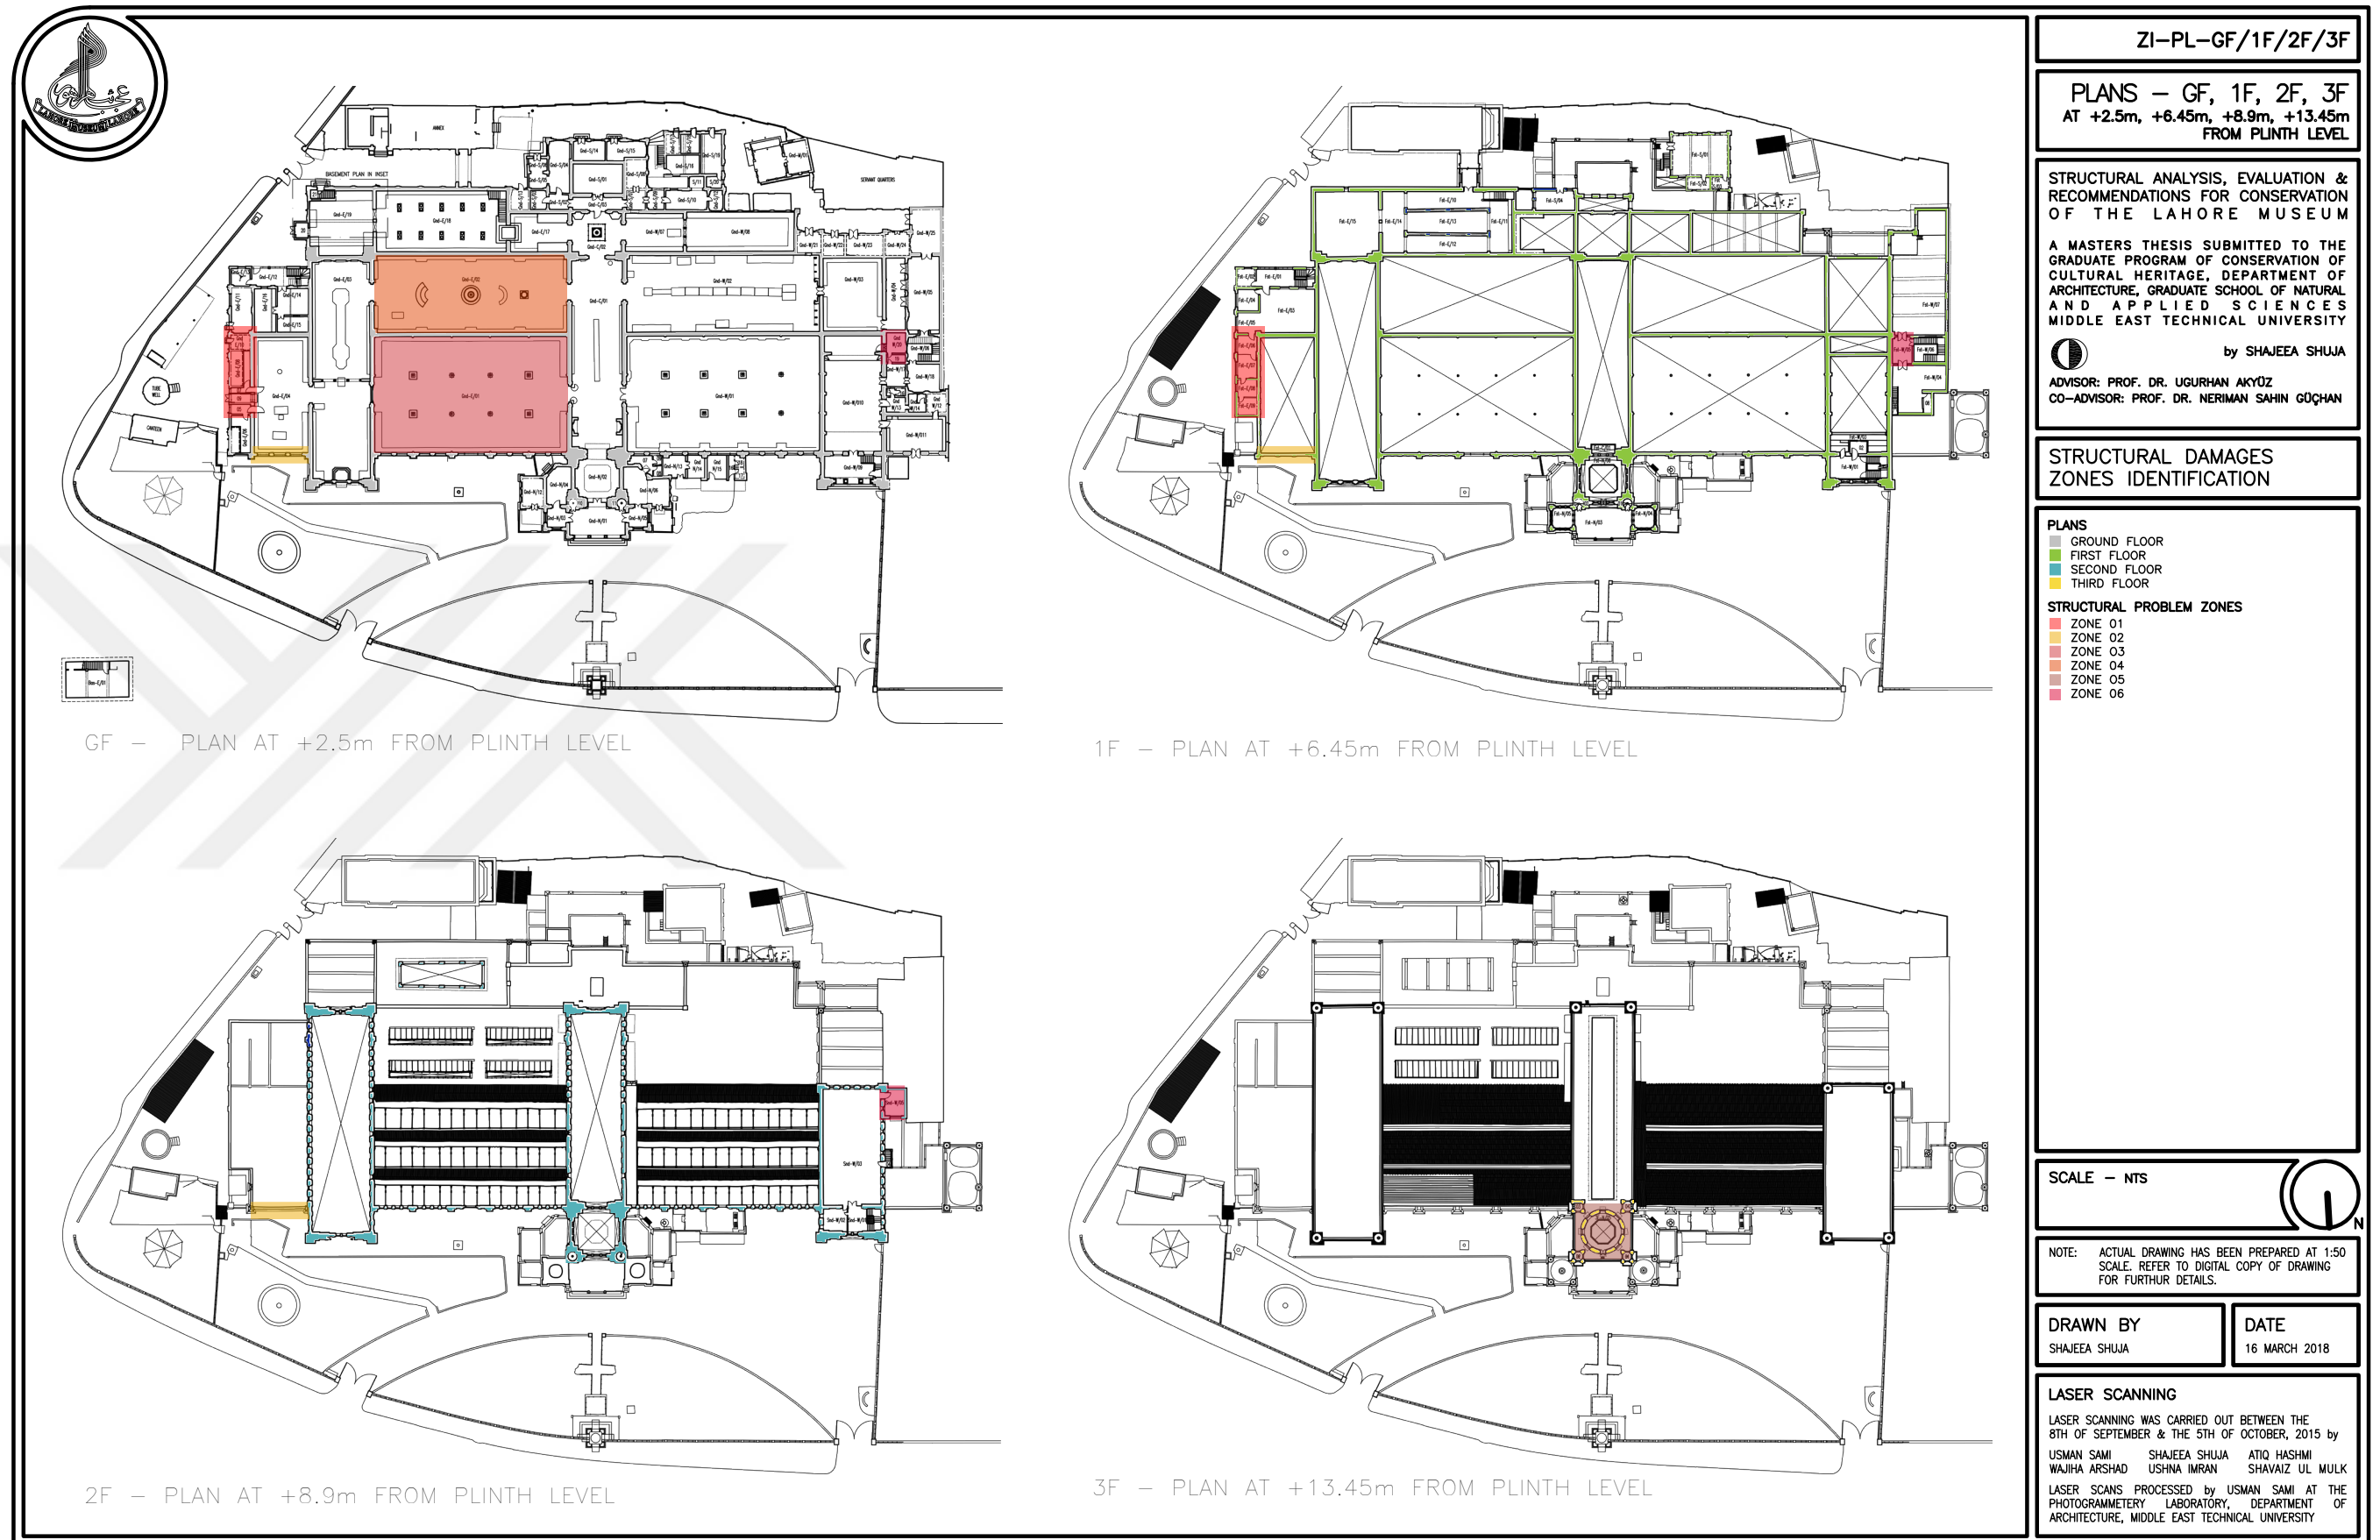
ZI-PL-GF/1F/2F/3F – Structural Damages Zone Identification – Plans – GF / 1F / 2F / 3F (2018)
